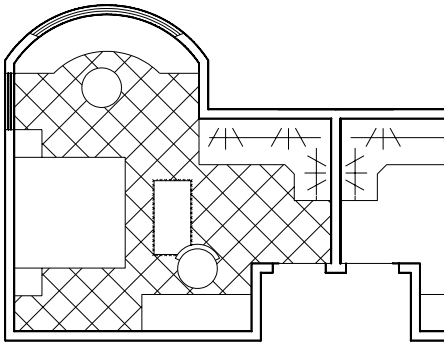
Drawing before creating a wipeout Figure 19-19 Drawing after creating a wipeout
